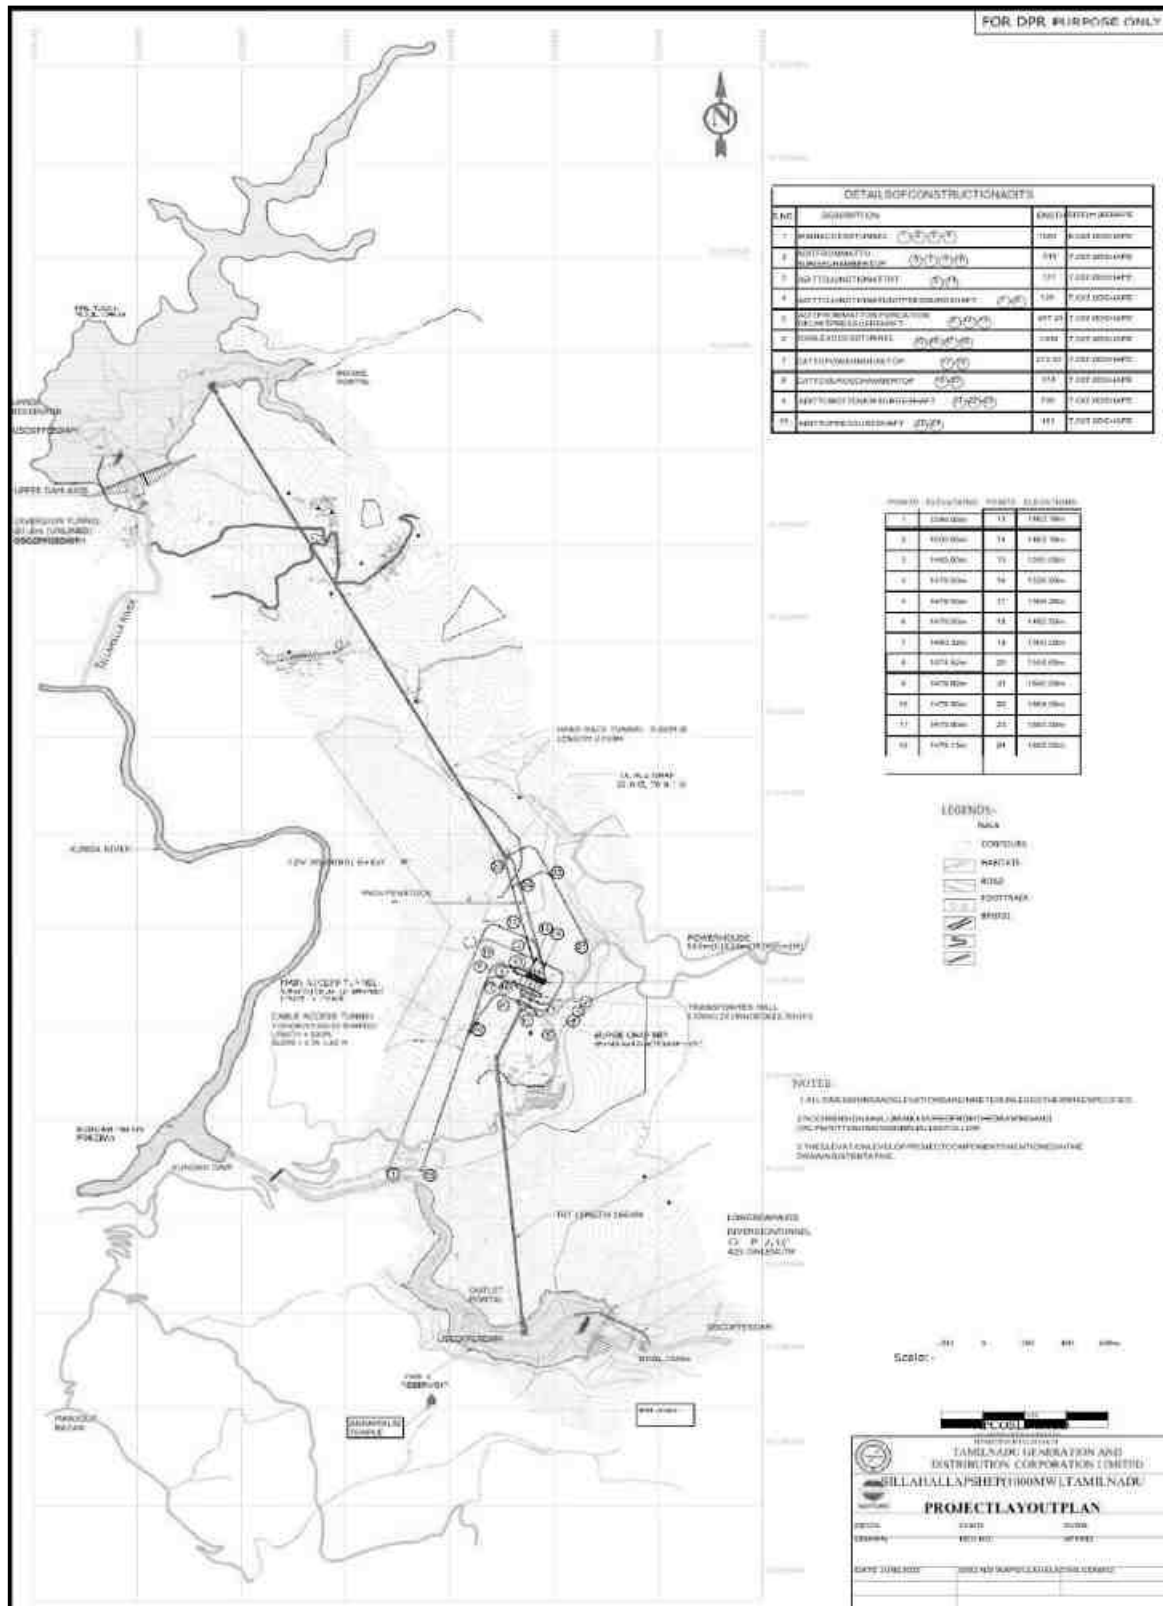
Project Layout of proposed Sillahalla PSHEP Stage-I
